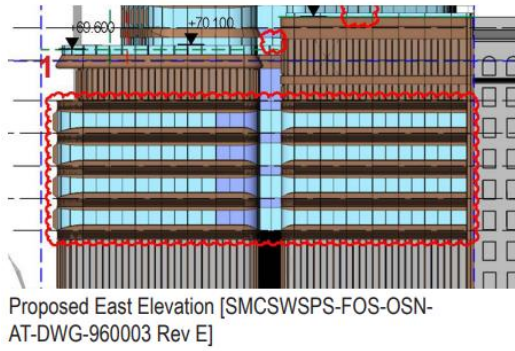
| Additional detailing clarifying the extent of corrugated details on the eastern and western elevations (Source: Modification Report)
